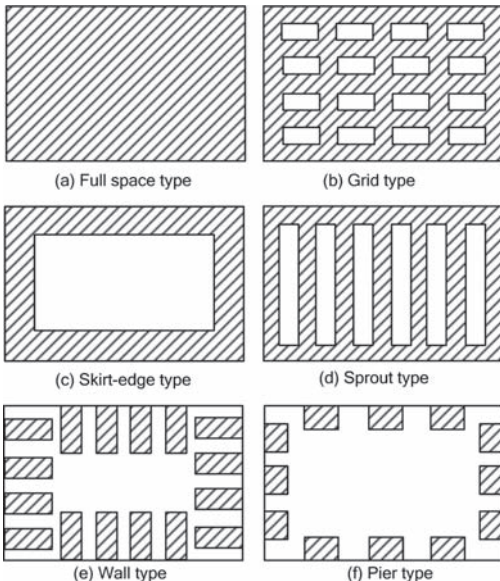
Layouts of the reinforcement of soils inside the excavation.
